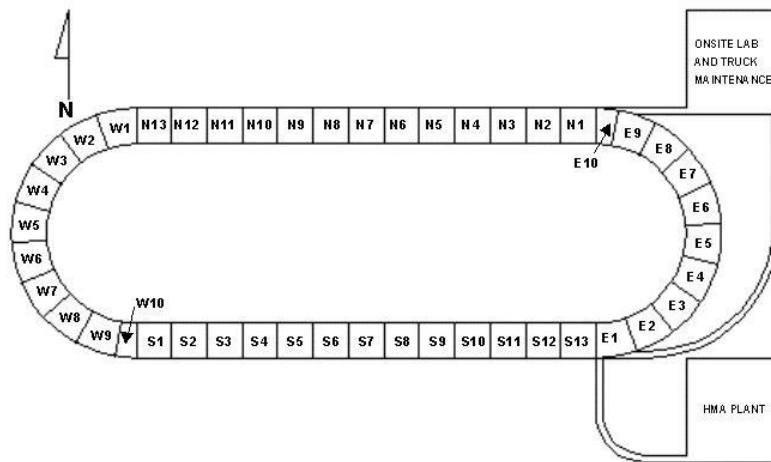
NCAT Test Track Layout [Pave Track, 2009]
